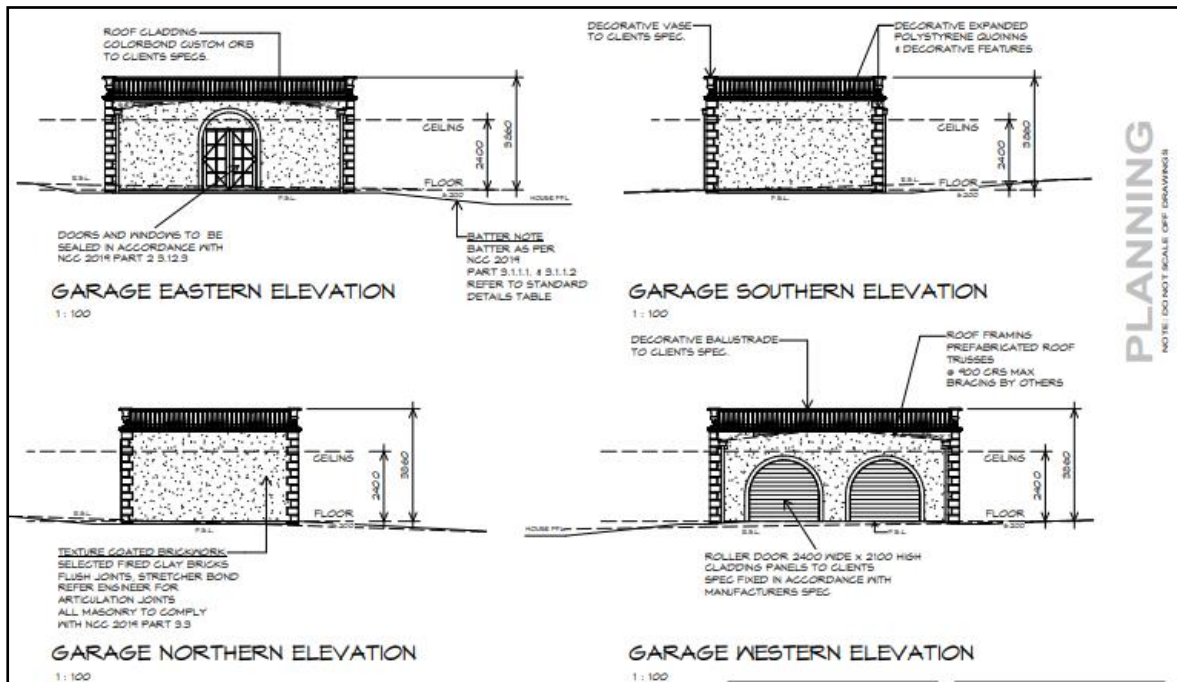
Proposed garage elevations (proposed shed is of similar size and dimensions).
